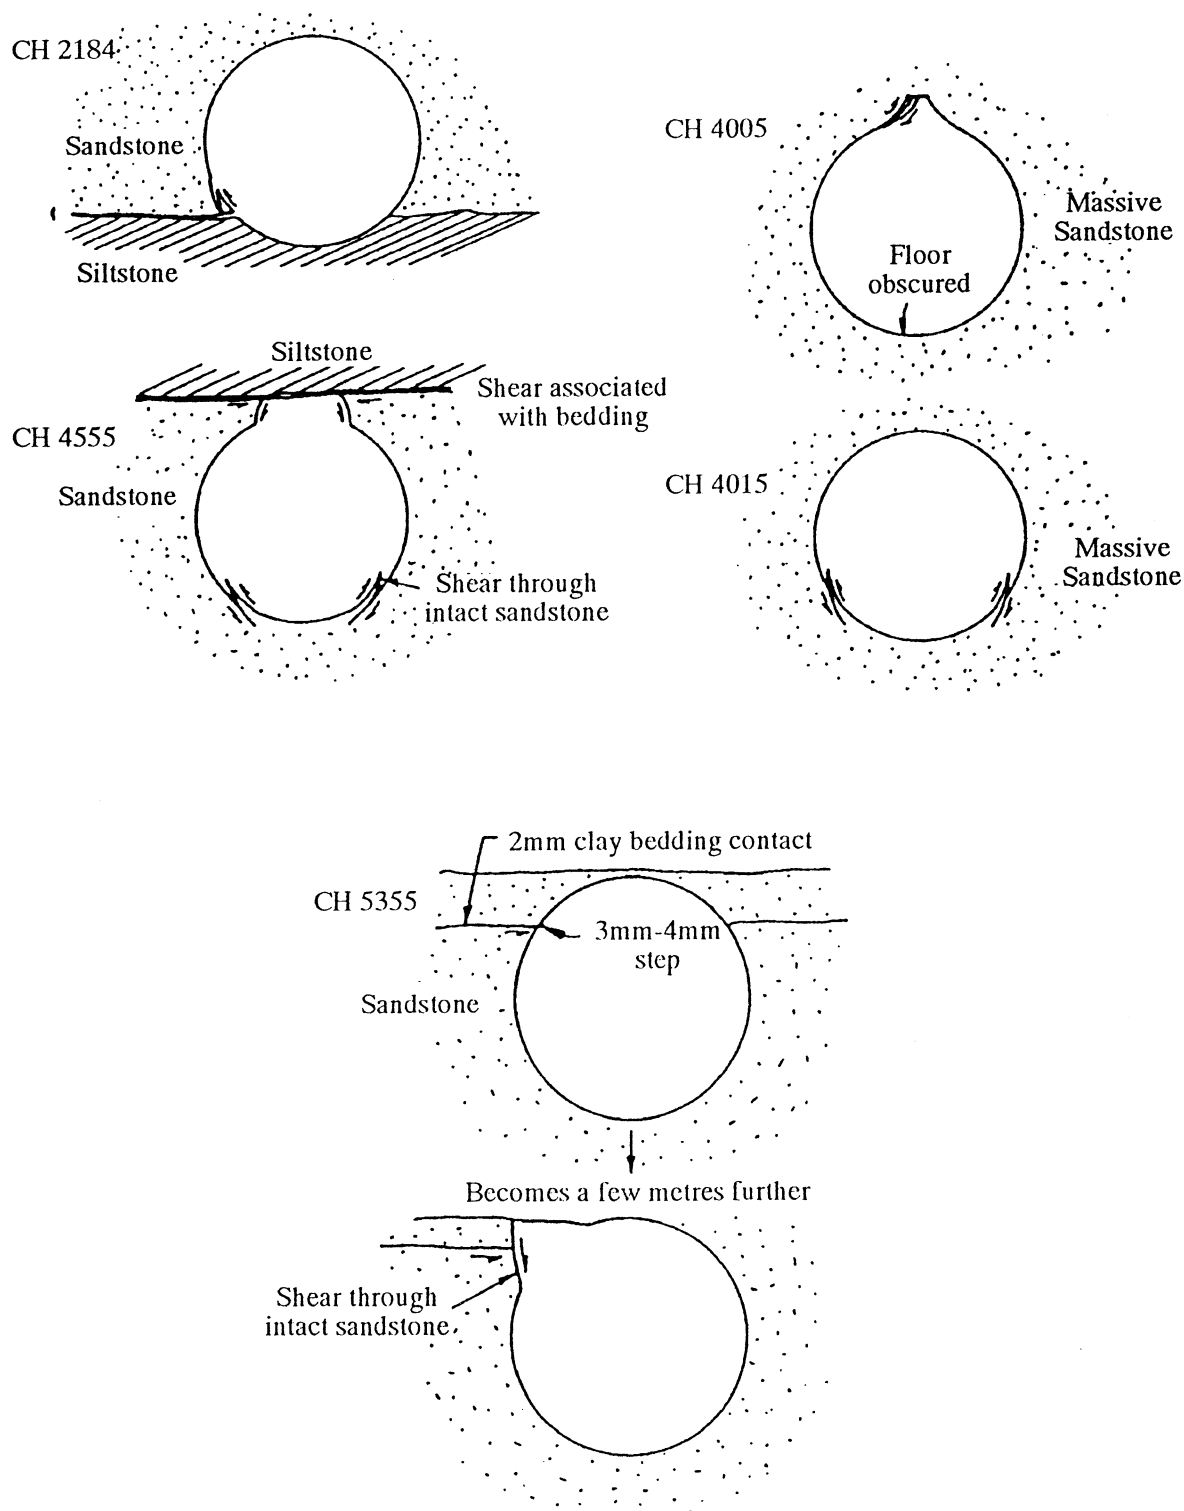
Typical Stress Failures Along the Boomerang Creek Tunnel
